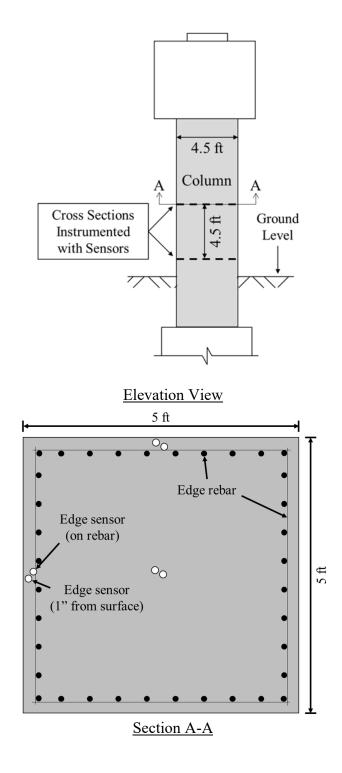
Birmingham column instrumented cross section locations (top) and temperature sensor locations on these cross sections (bottom)
